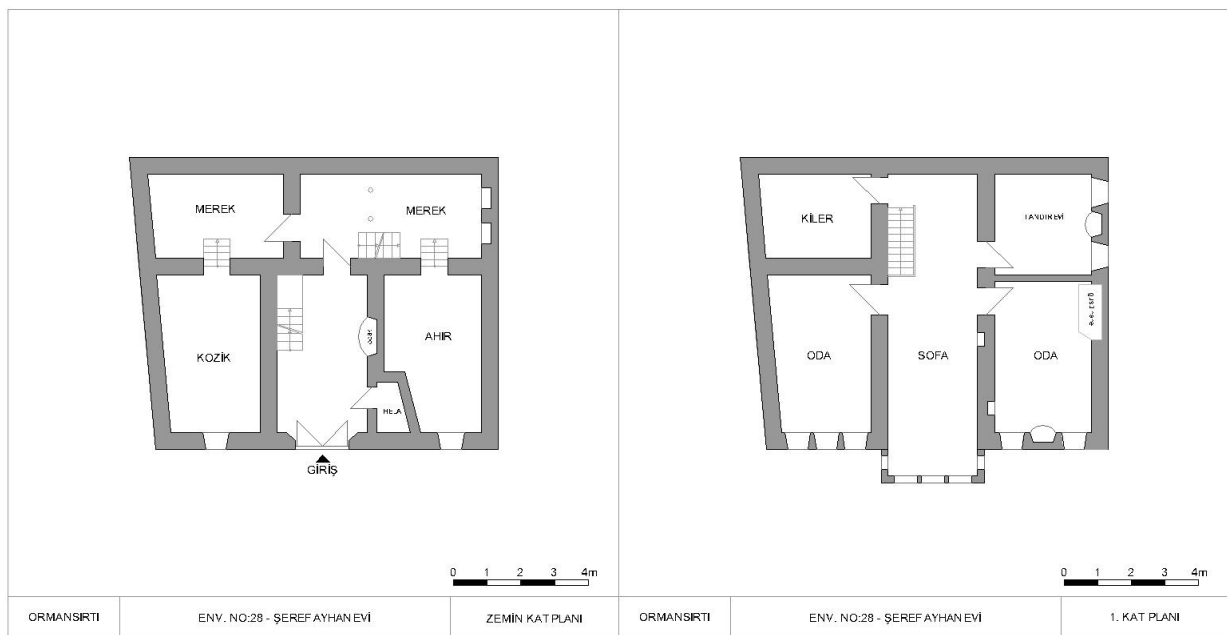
Plan Scheme of Şeref Ayhan House (Ormansirtı Village).
